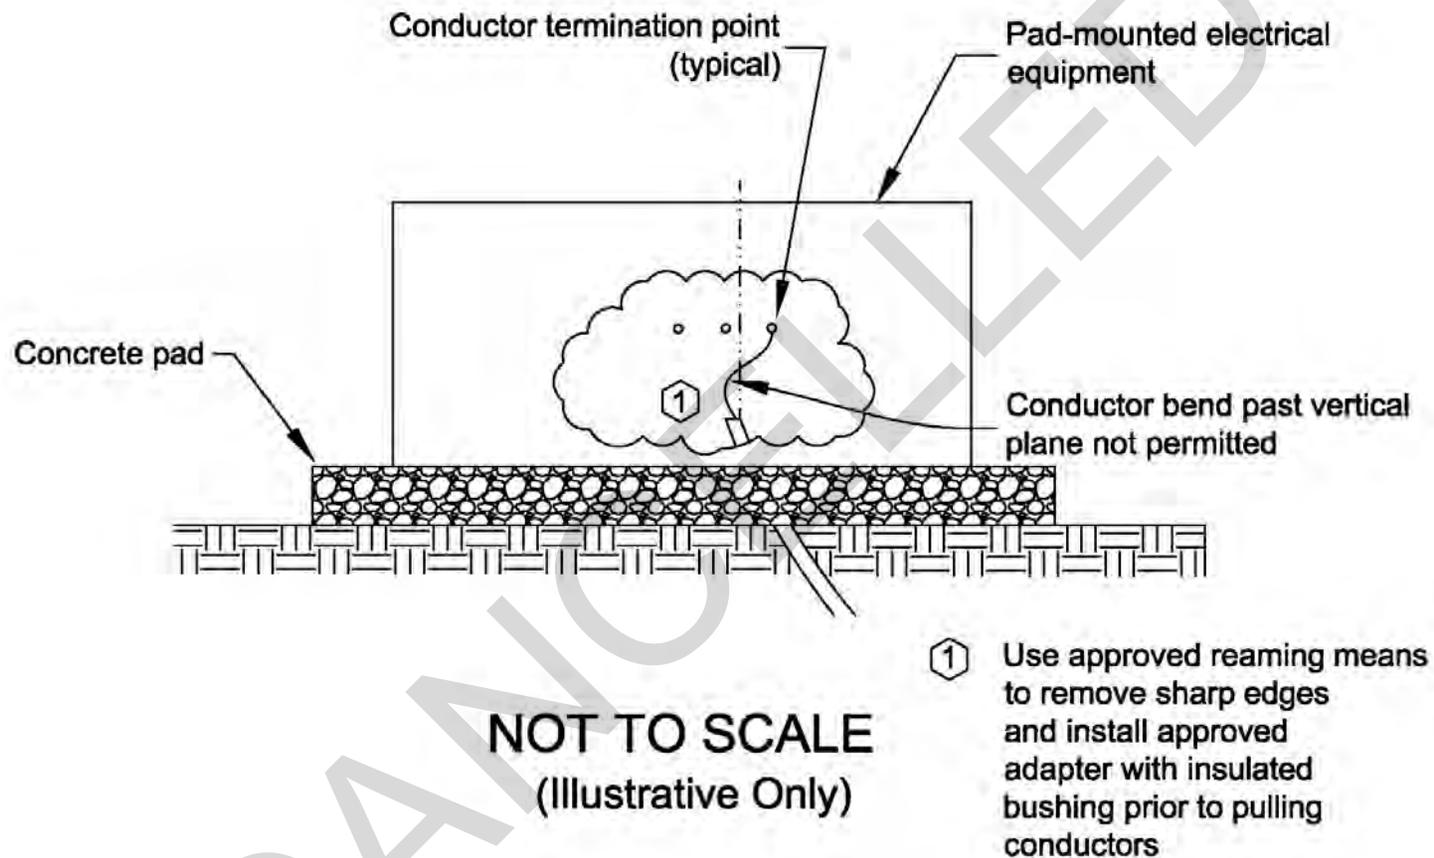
HDPE or Rigid Conduit Electrical Equipment Transition
